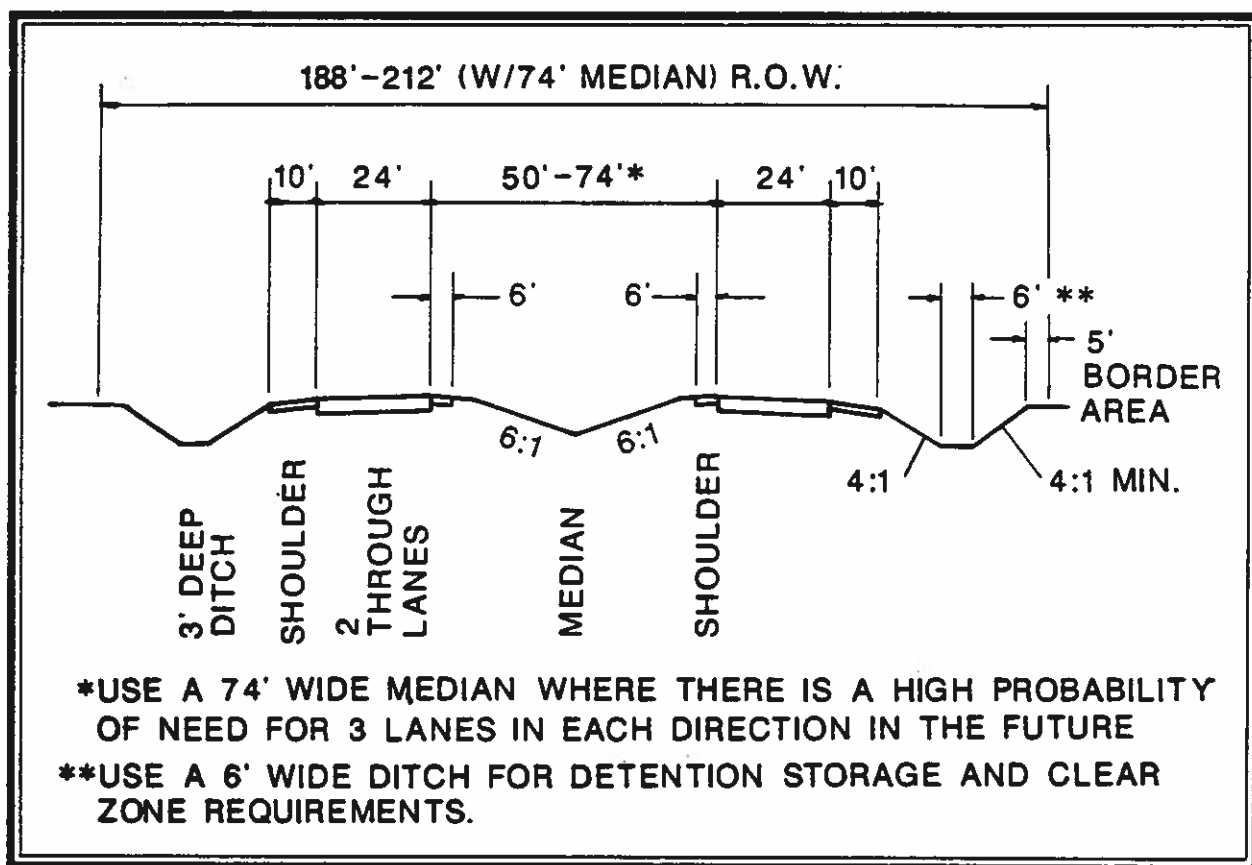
Desirable Rural SRA Cross-Section without Frontage Roads
